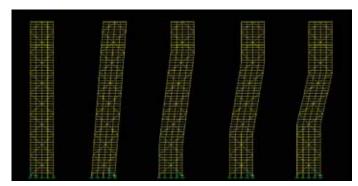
60-story tilted braced tubes (elevation view). 图7-1. 60层高的倾斜式框架简体(立面视图)
